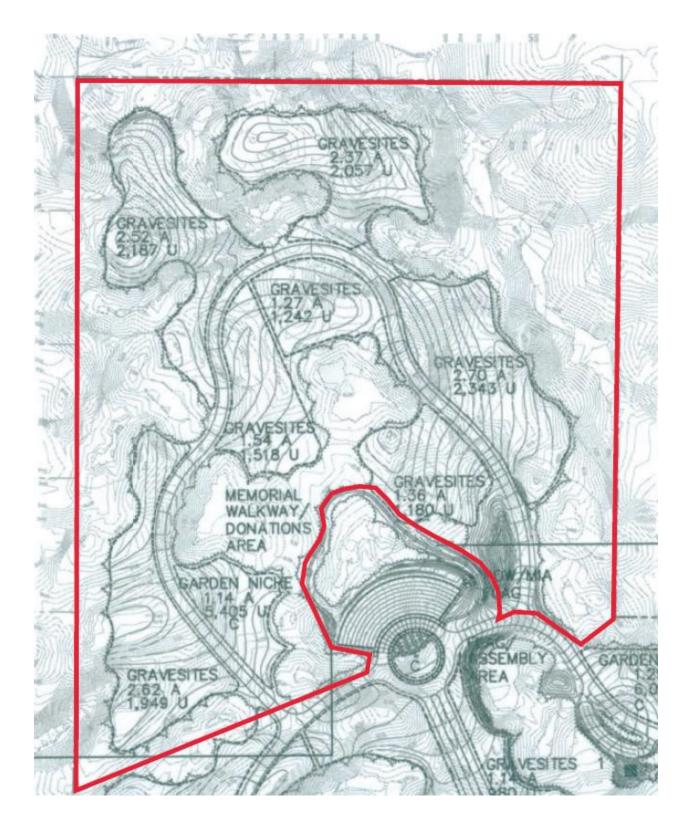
1995 Master Plan for Phase 3 Cemetery Development.
